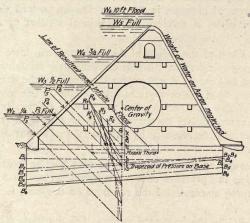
Resultants of Forces Acting on a Reinforced Concrete Dam.
